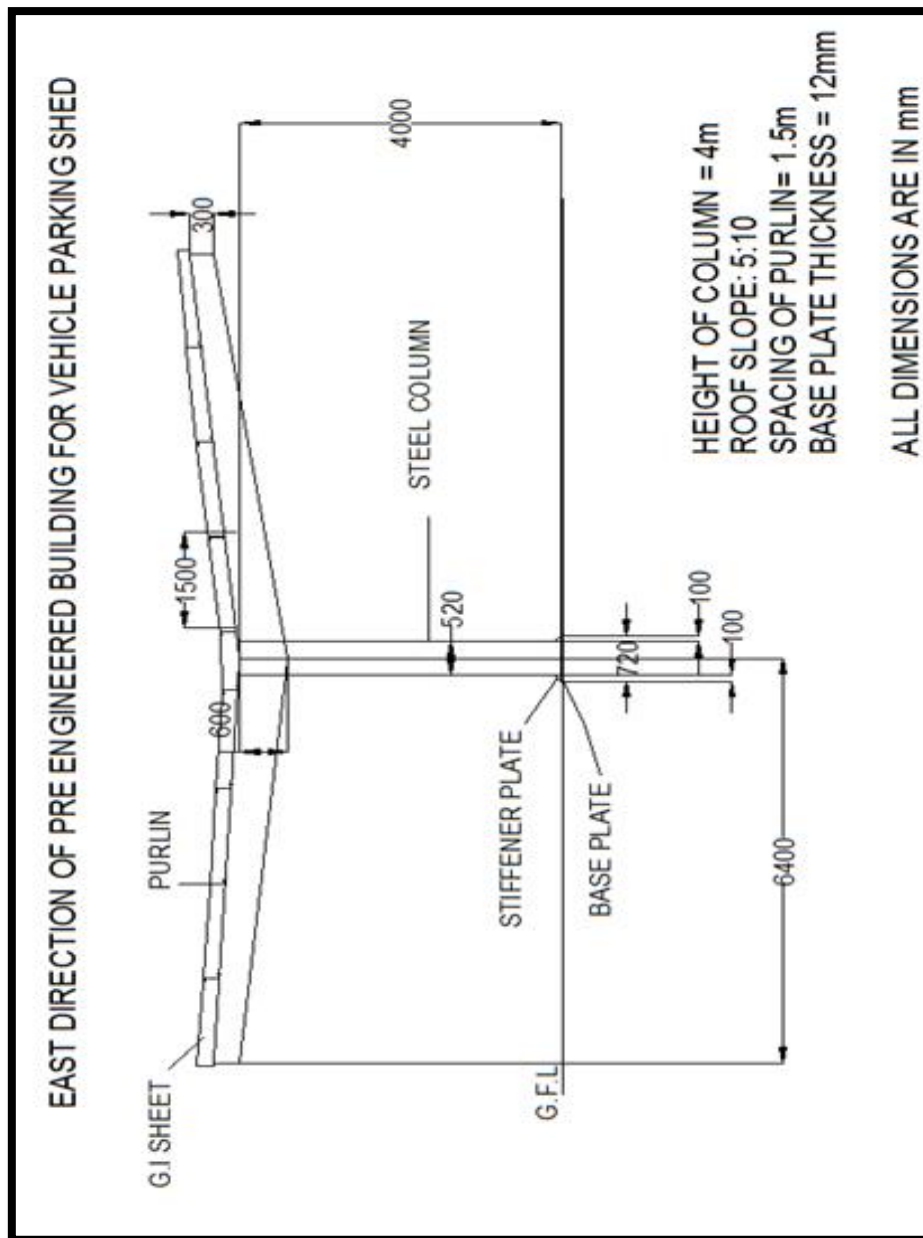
East Direction View of Pre Engineered Building for Vehicle Parking Shed
